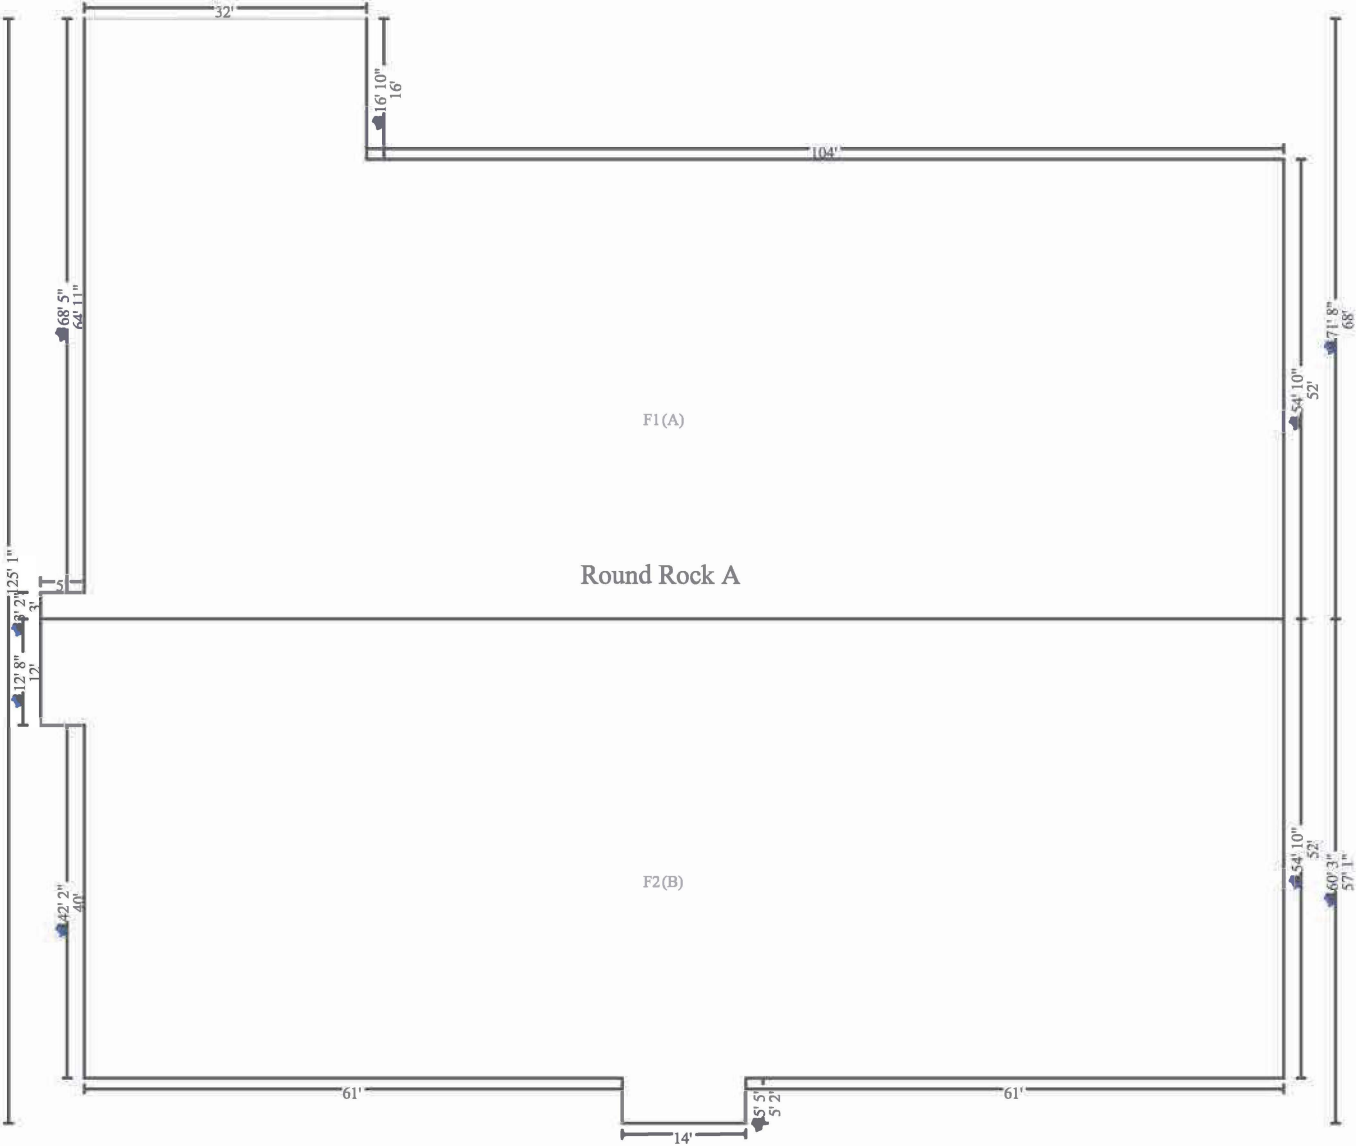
EXHIBIT A DRAWINGS, PLANS AND SPECIFICATIONS
